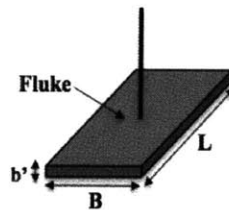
Rectangular-shaped plate anchor where b' is the fluke thickness.
